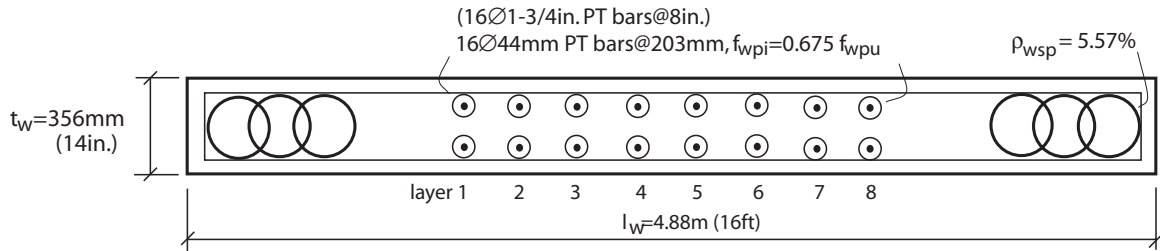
Wall pier post-tensioning steel reinforcement
